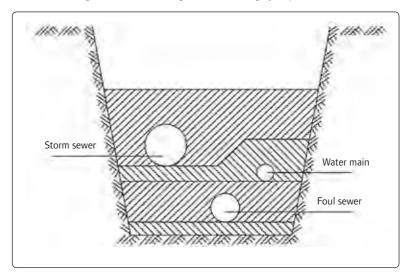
Water-retentive trench dam construction using as-dug material.
